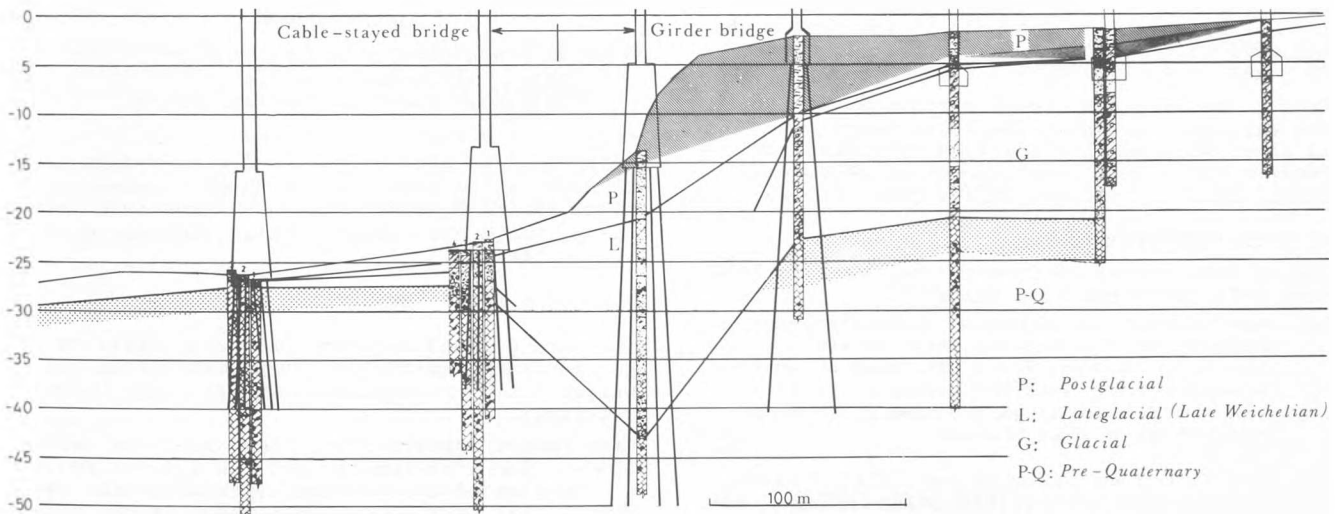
One pylon and one side span pier for the cable-stayed bridge and two piers for the girder bridge to be founded on piles in weathered white chalk. The figure also shows the characteristic geological structure.
